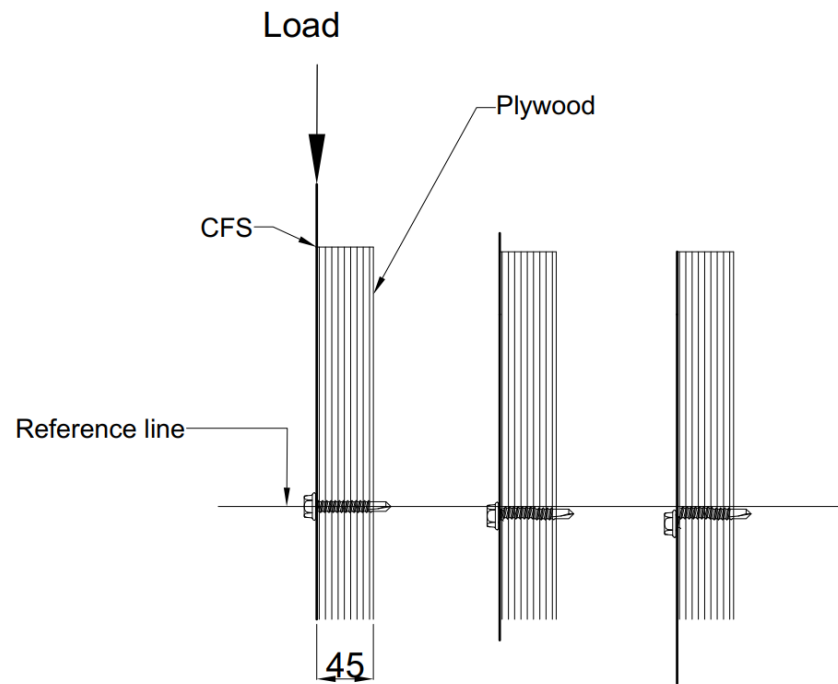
Failure mechanism of the specimens with self-drilling screws
